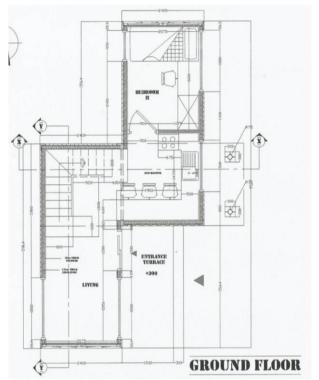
Ground Floor Plan of proposed 2 bedroom house [9].
